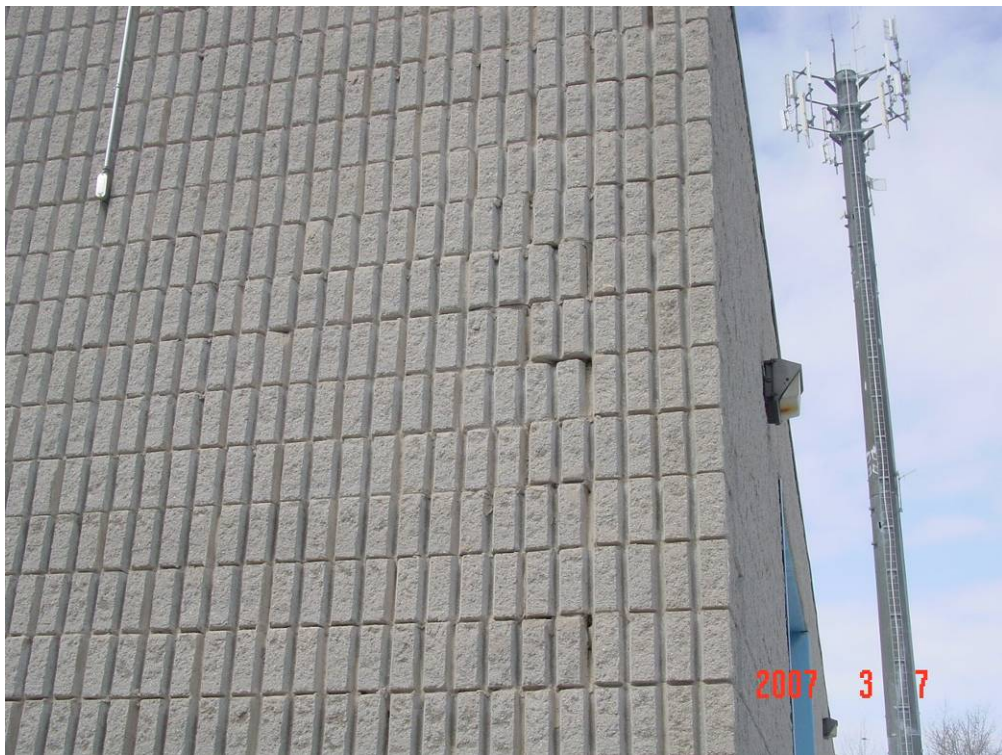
Original warehouse portion of the building constructed with split-faced concrete block with siding accents to match newer addition.
